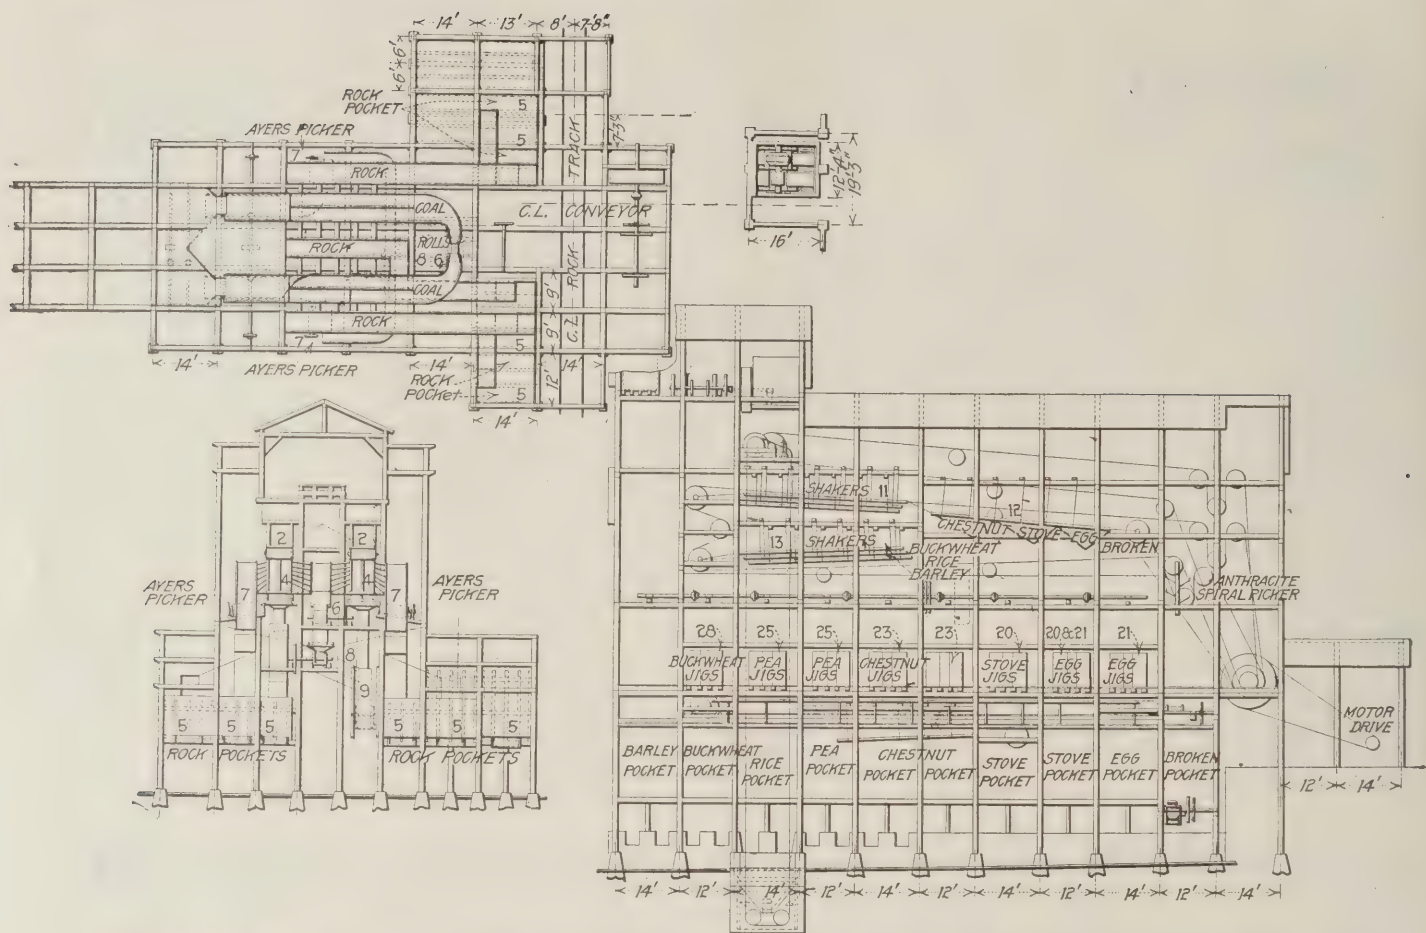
PLAN AND CROSS-SECTION OF THE ROCK-SEPARATOR HOUSE, WITH SECTION OF THE BREAKER Showing the arrangement of machinery in both buildings. The jig and shaker drives are at right angles to each other.
